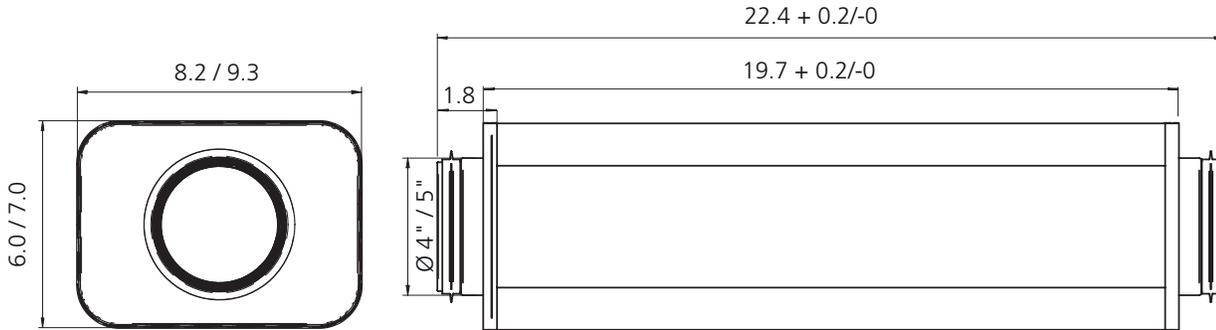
Dimensional drawing sound attenuator CLA Ø 4" – 19.7 or Ø5" – 19.7
